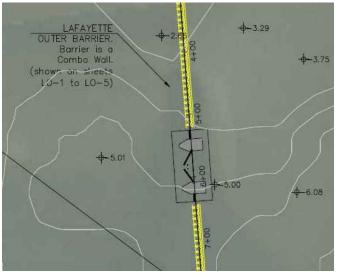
Proposed Storm Surge Barrier Wall and Miter Gate
